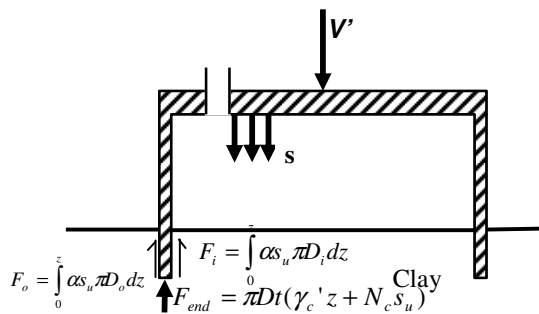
Forces acting on a caisson during installation in clay.
